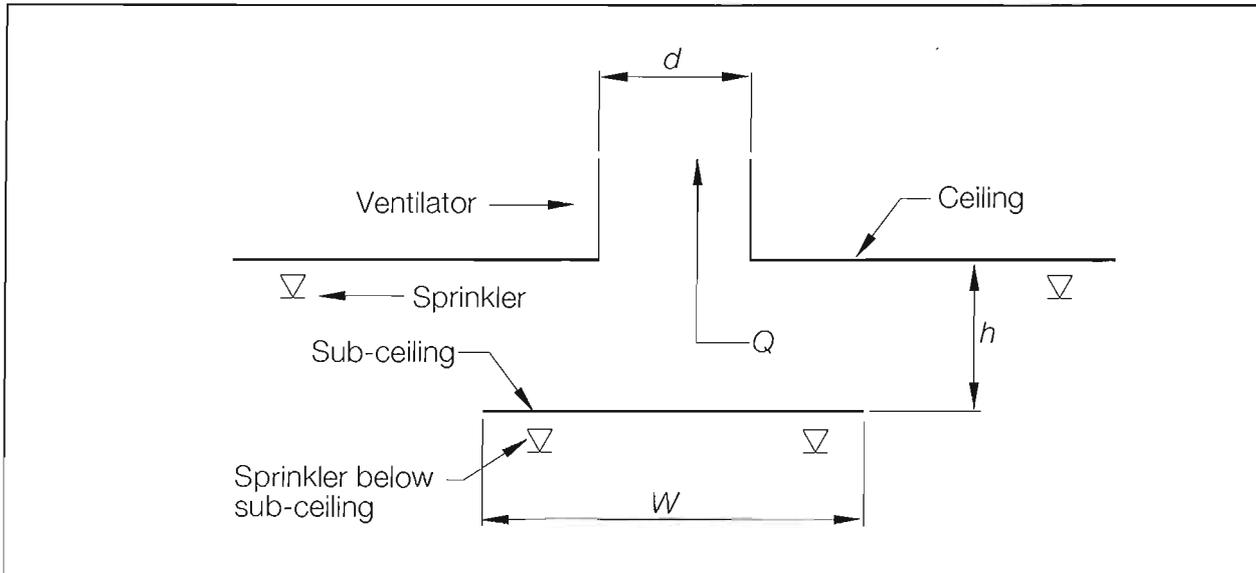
F2 Sprinklered sub-ceiling below a ventilator
